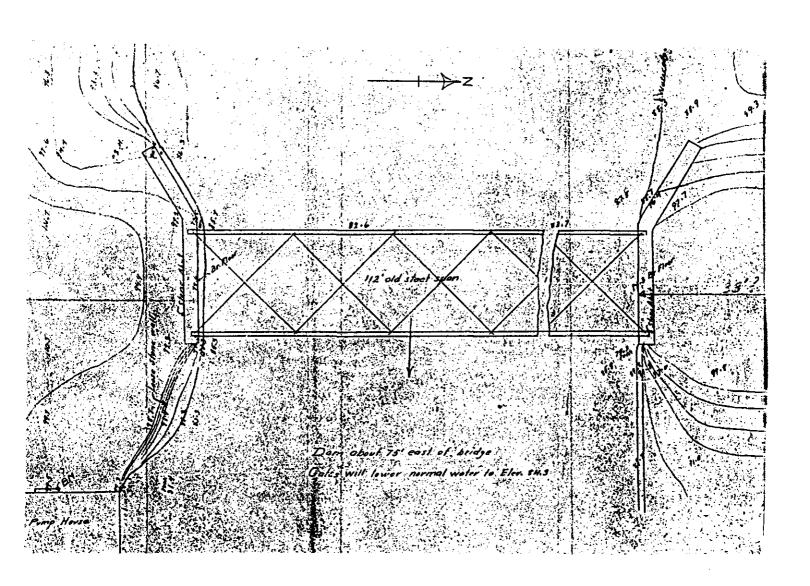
Detail from bridge design: "Topographic plan showing previous superstructure." Untitled. Undated.
